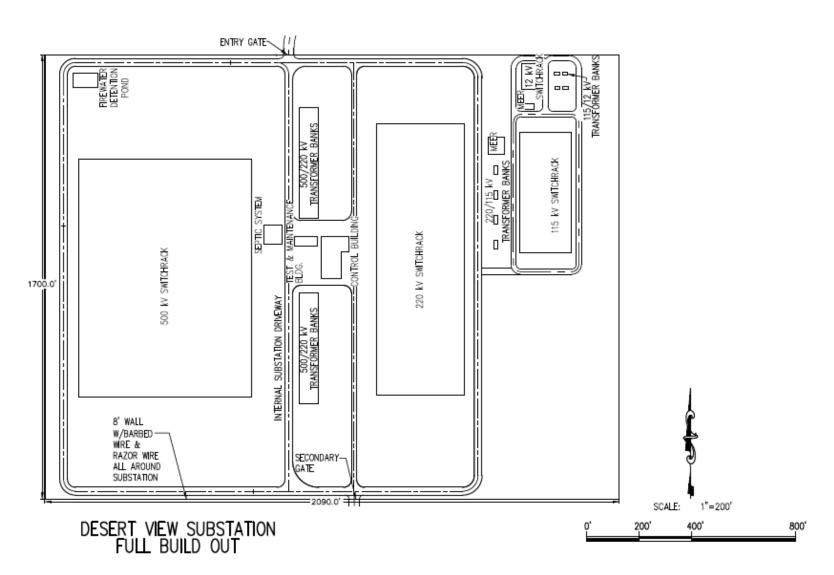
A-b Alternative Desert View Substation Layout for Full Build Out
